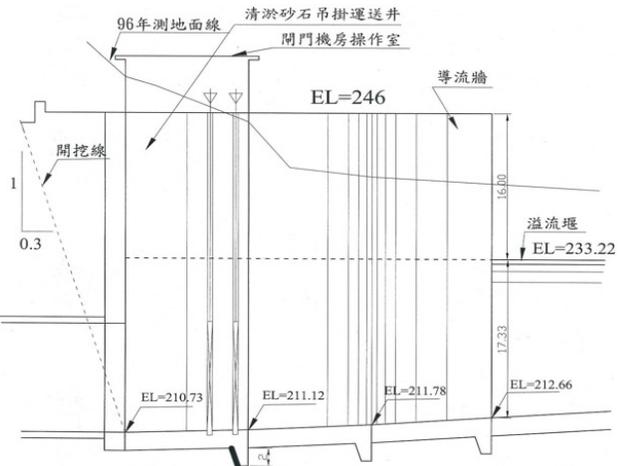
Shihmen Diversion Tunnel A1-1 Inlet Longitudinal Detail Design Graph A
